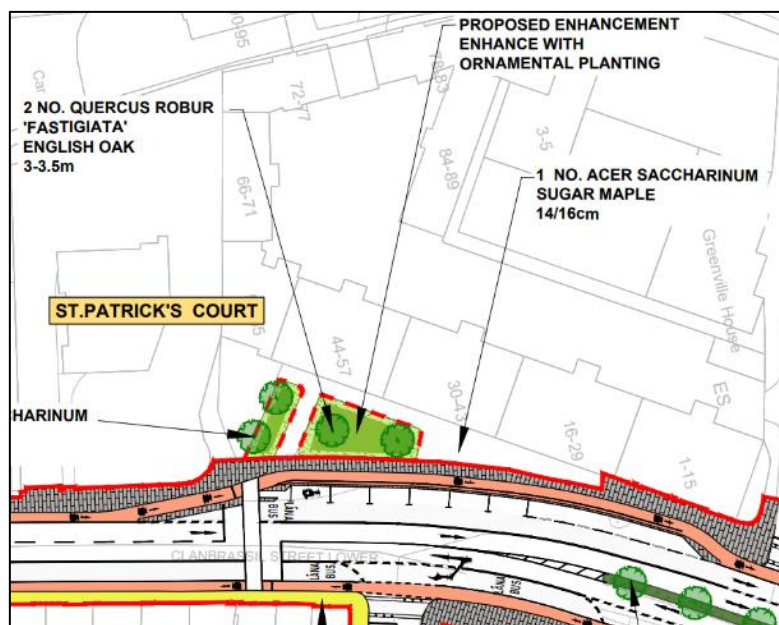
Proposed Landscaping at St. Patrick’s Court
